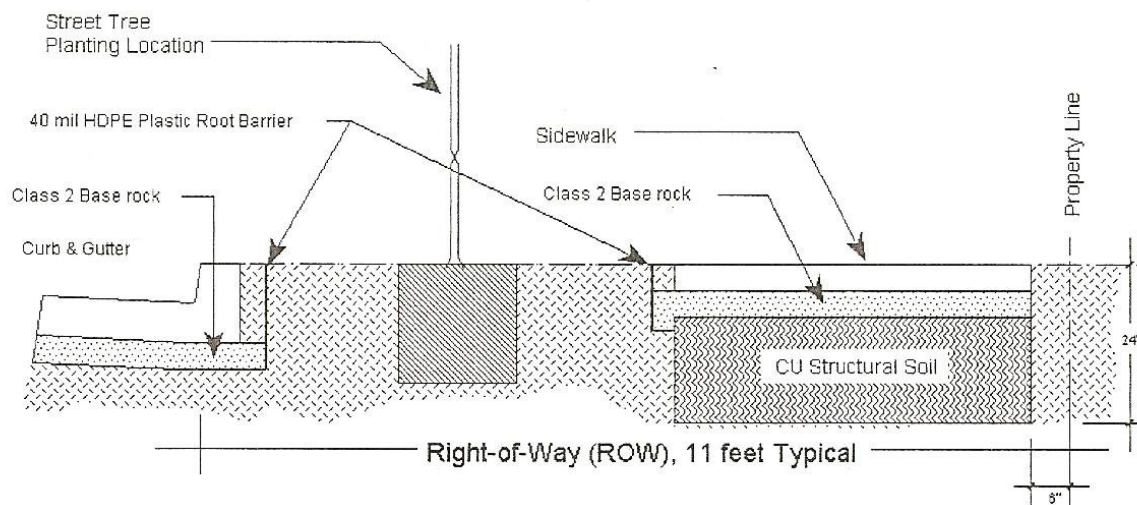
Tree planting diagram for parkway sidewalk construction.
